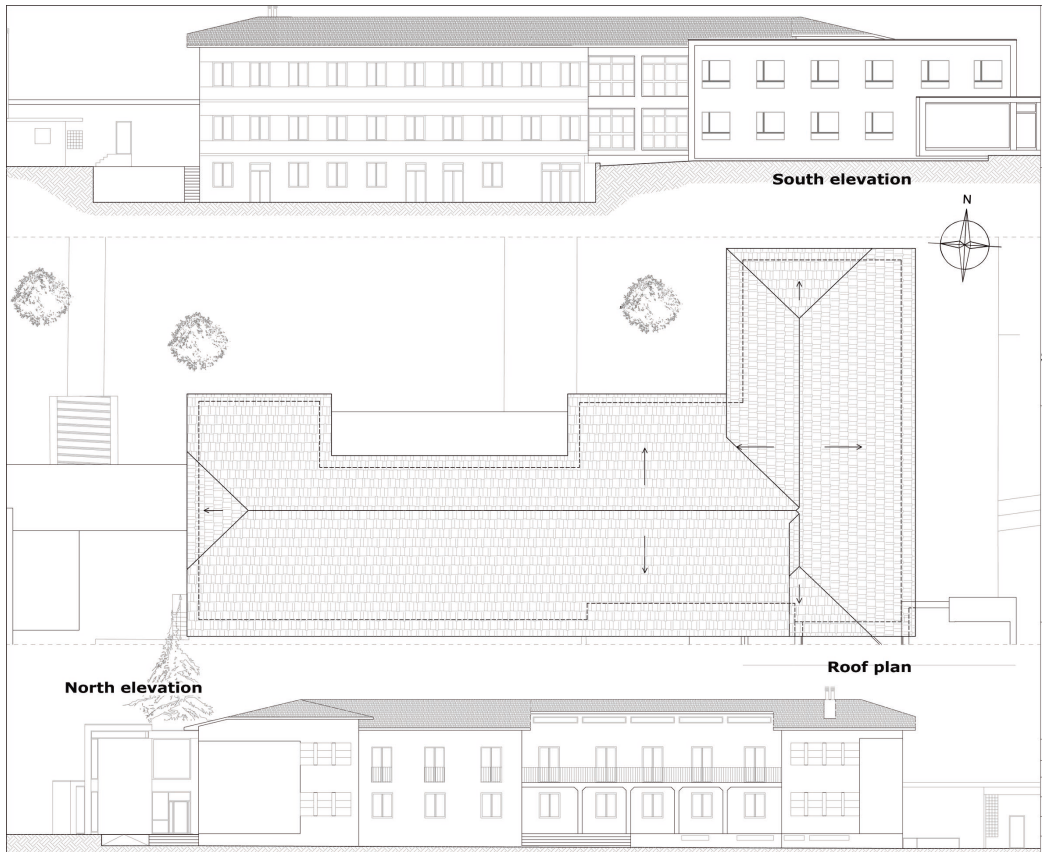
The relief of the building's roof plan and the main elevations useful to provide a general overview of the object of study.
